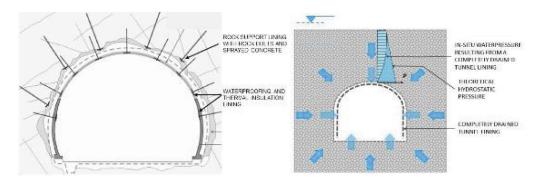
Principal sketches of drained tunnel lining system in a rock tunnel in Scandinavian practice. Left: The layout of the lining system (after Broch et al. 2002) Right: The in-situ groundwater pressure situation around a completely drained tunnel.
